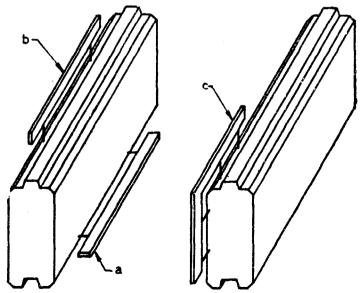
Illustrating Form Tolerances of Wall Slab
